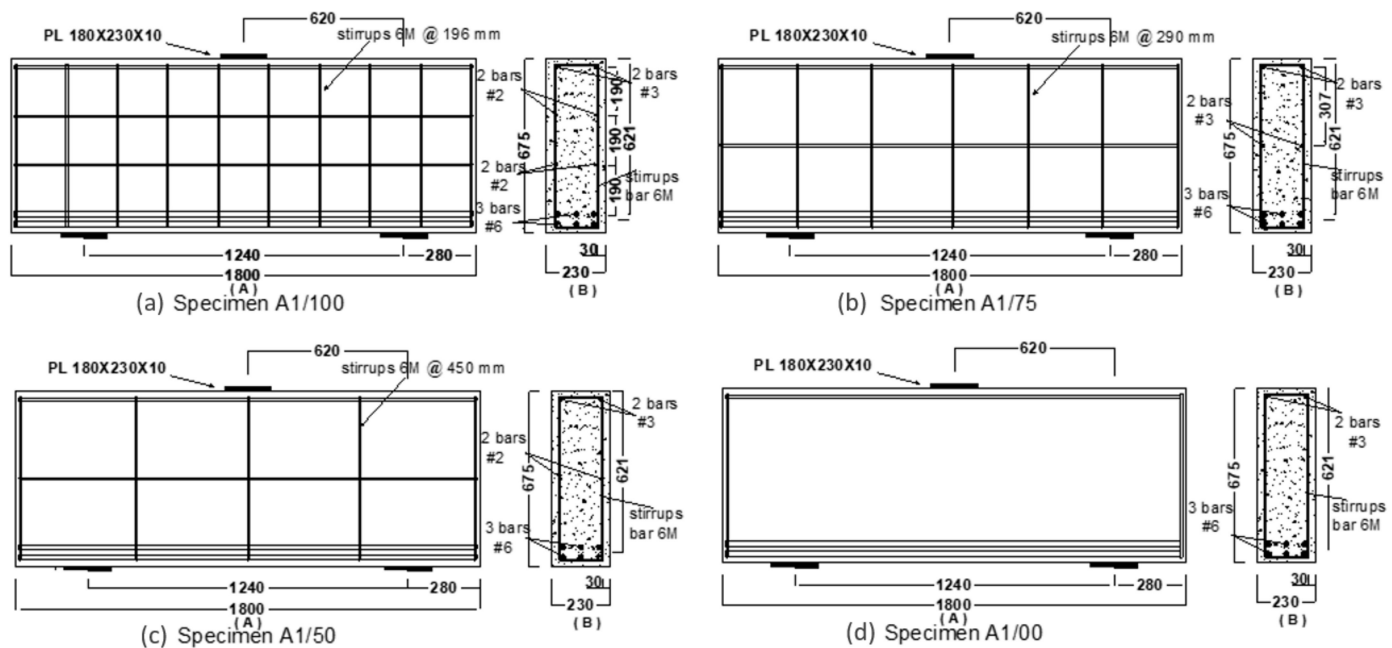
Reinforcement details and specimens' geometry of four beams: (a) Specimen A1/100, (b) Specimen A1/75, (c) Specimen A1/50 and (d) Specimen A1/00; meanwhile (A) showed the cross section and (B) showed the elevation in each subfigure.
